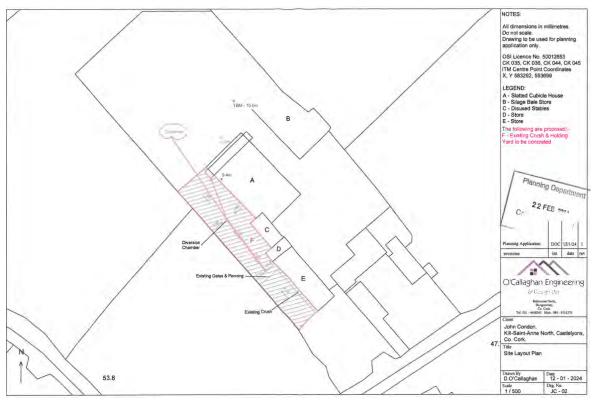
Site Layout Plan- depicts the existing structures present within the farmyard in addition to the proposed crush and holding <u>yard</u> to be concreted.
